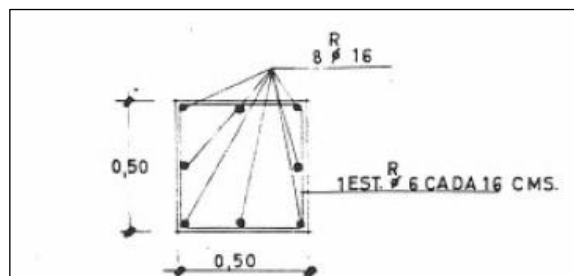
First floor Column Section. Source: (SIGMA & Servicios de Ingeniería, 2016)
